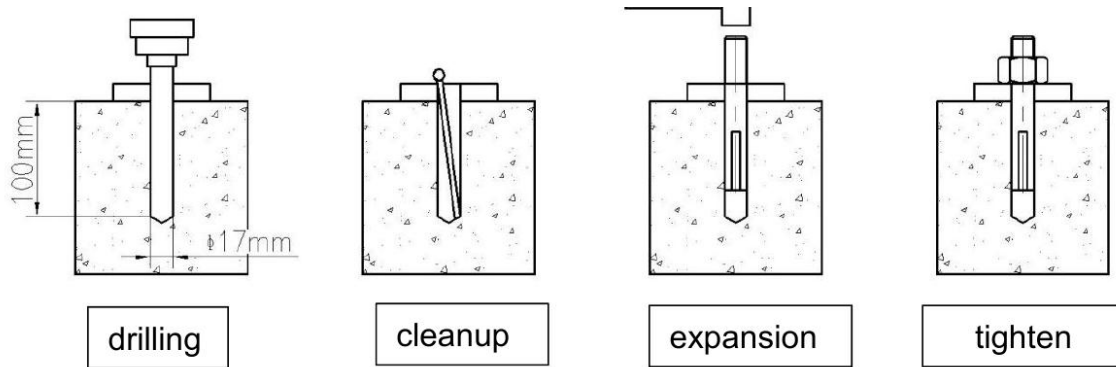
Anchor bolt installation sequence: drilling, cleanup, expansion, tightening
